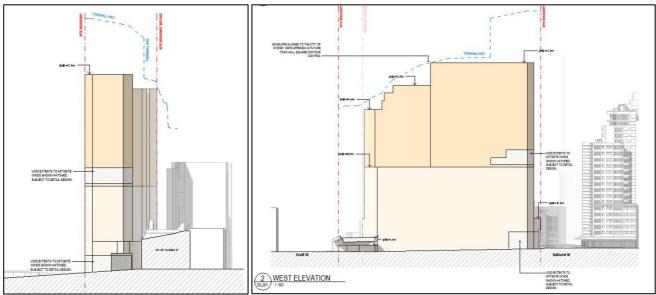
Building Envelope – Southern Elevation (Left) and Western Elevation (Right) Source: Hassell
